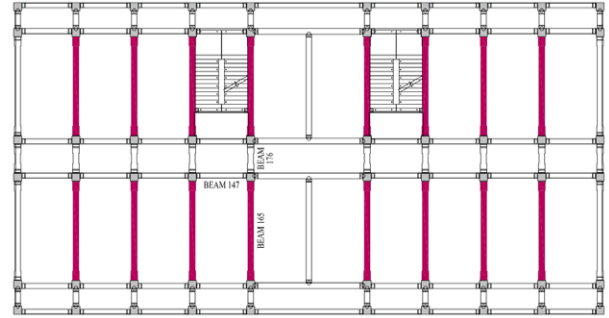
FRAME BEAMS DESIGNATED AS MAIN BEAMS
